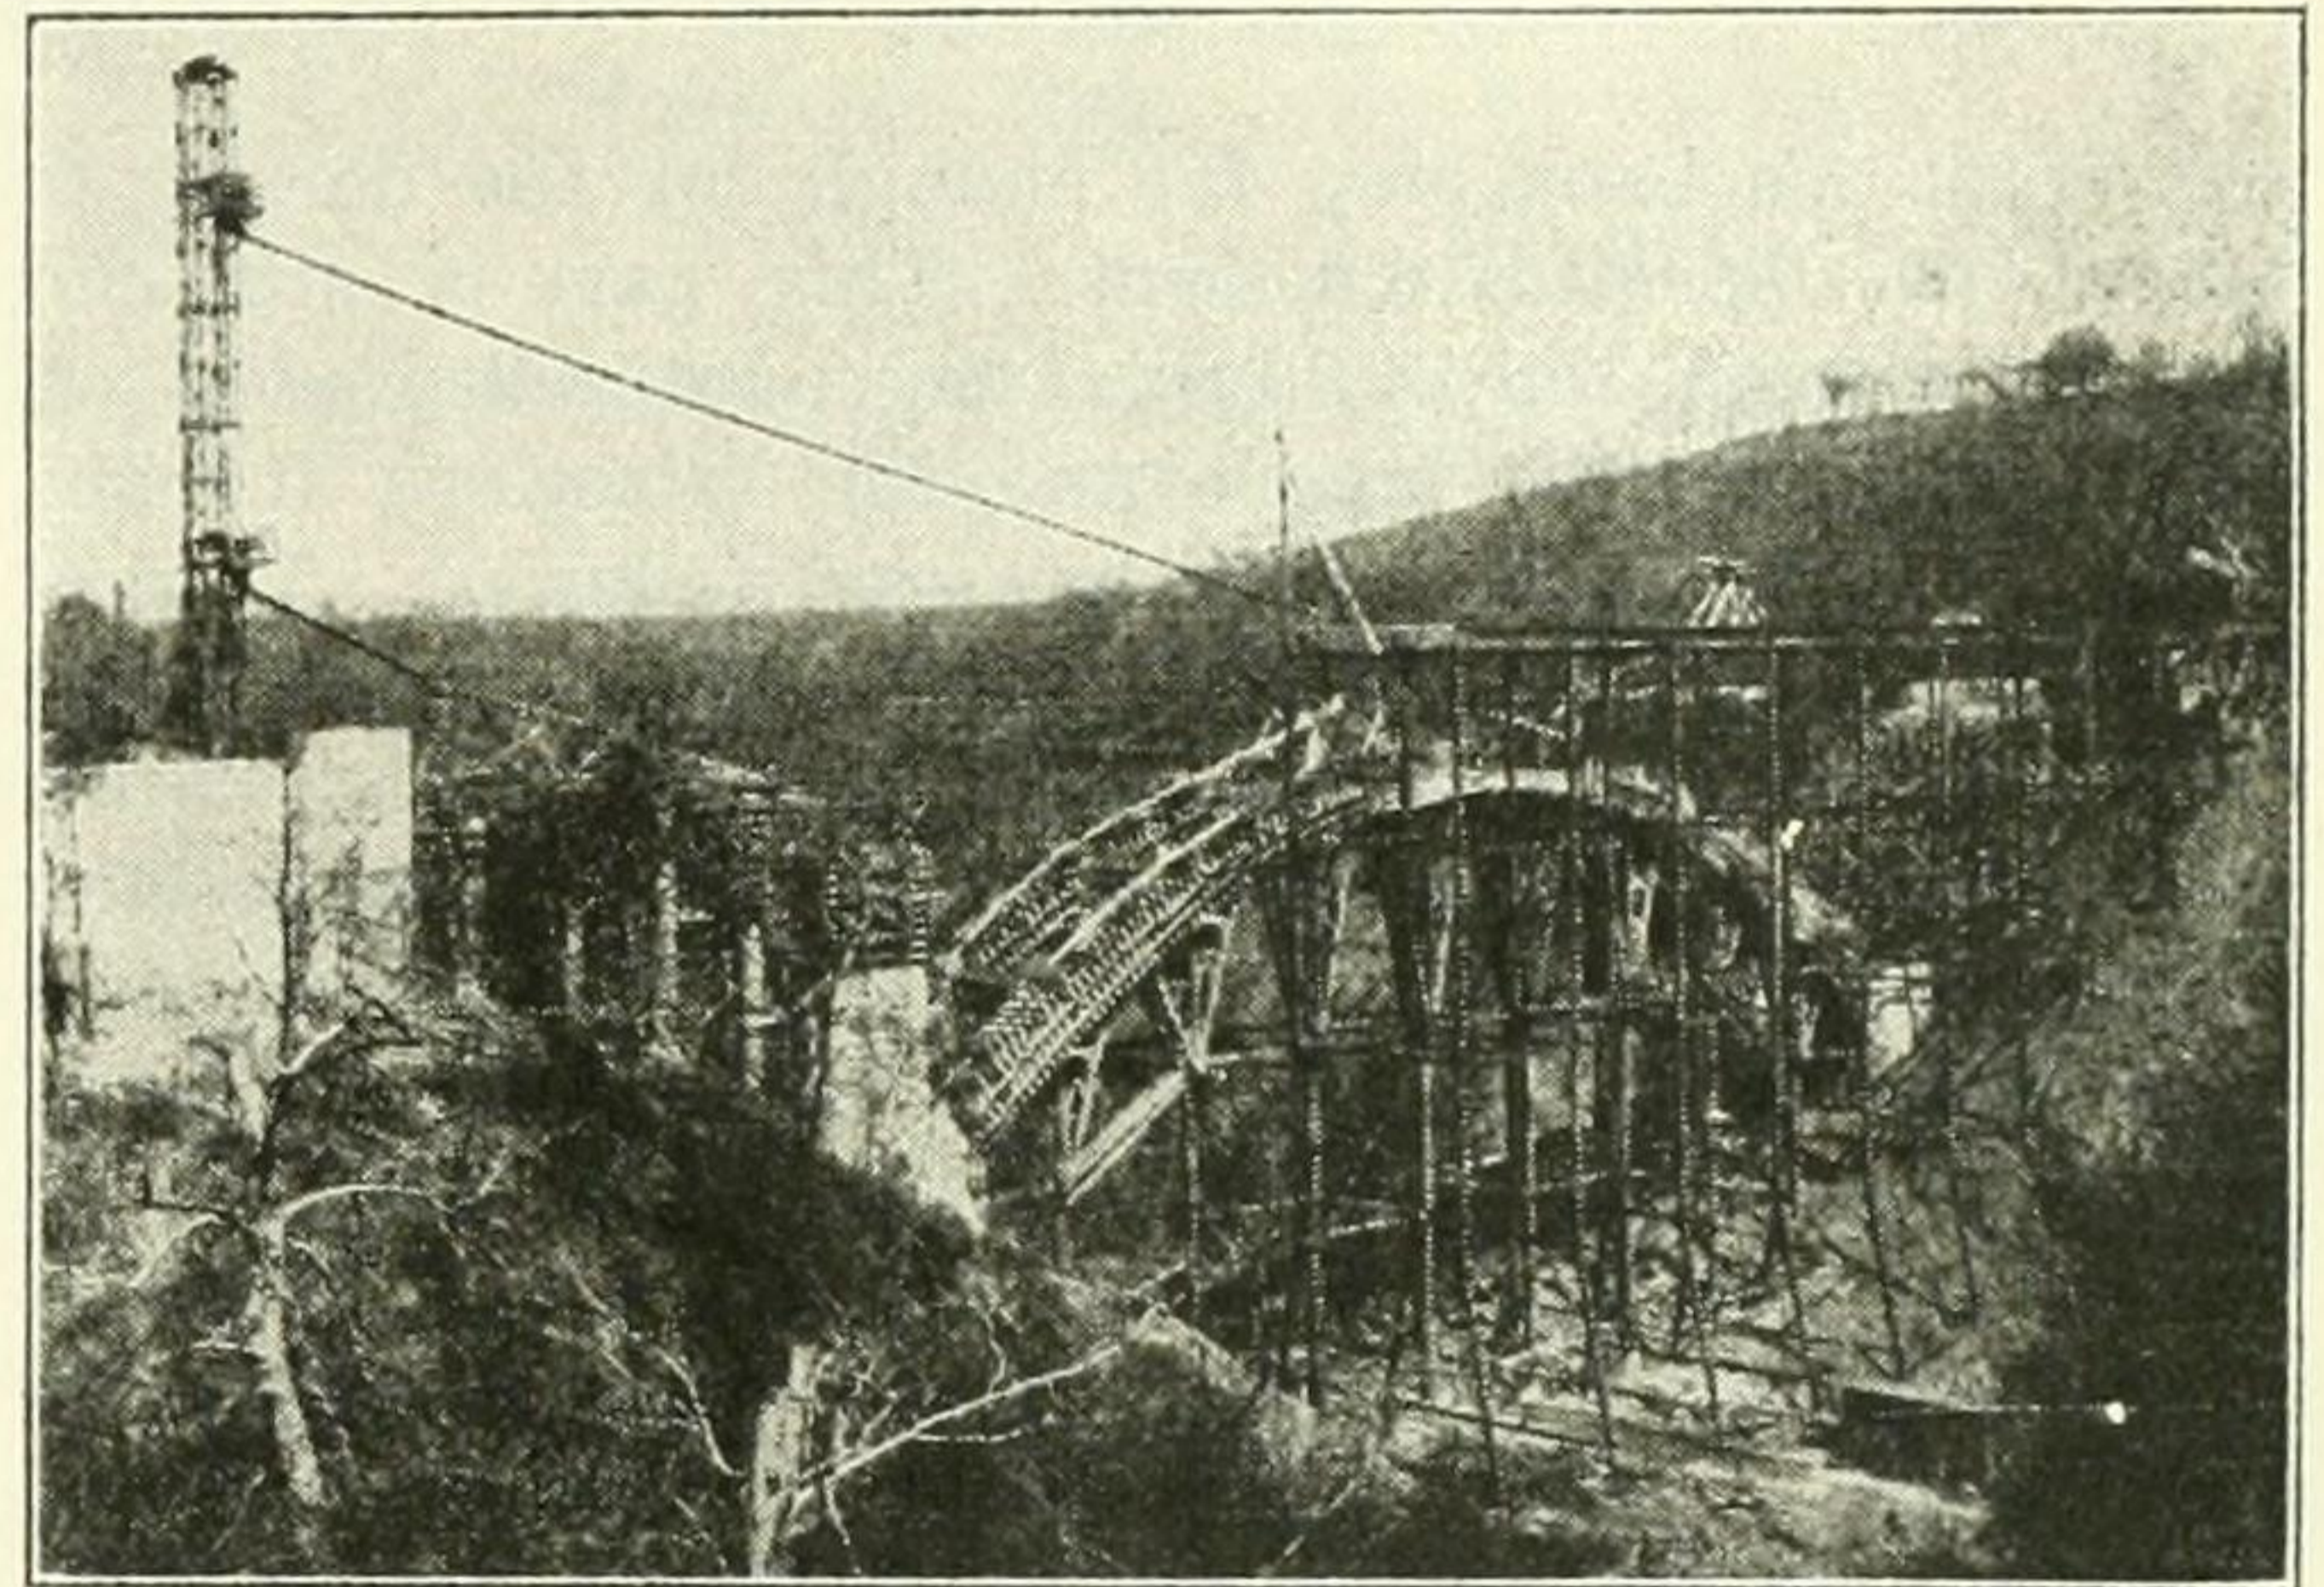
CONSTRUCTION TRESTLE, CENTERING AND CHUTING PLANT
